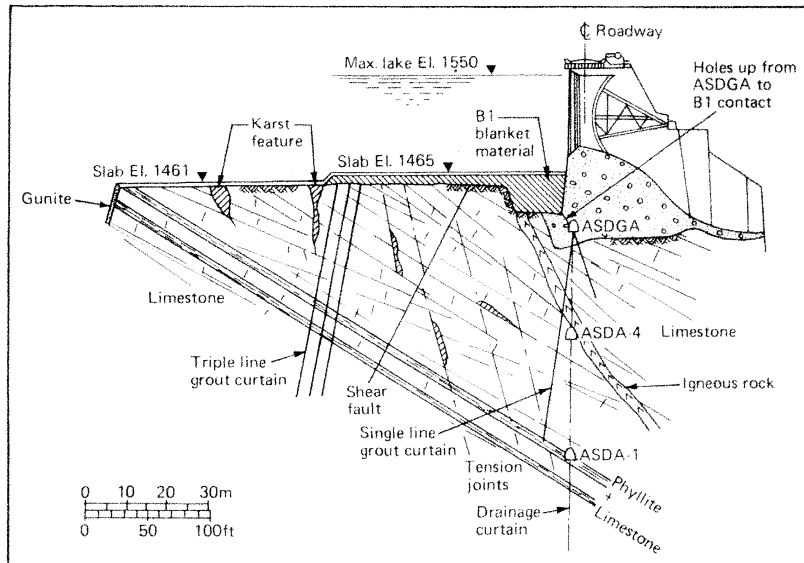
General cross-section of auxiliary spillway upstream protective works
